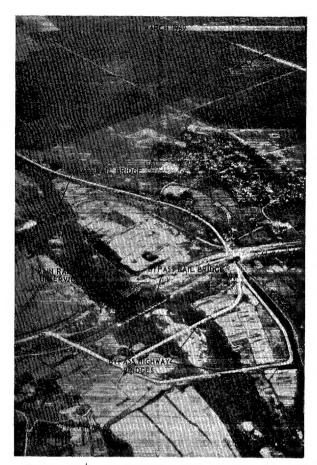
PHUONG DINH RAILROAD AND HIGHWAY BRIDGE OVER THE LACH TRUONG 25X1D
